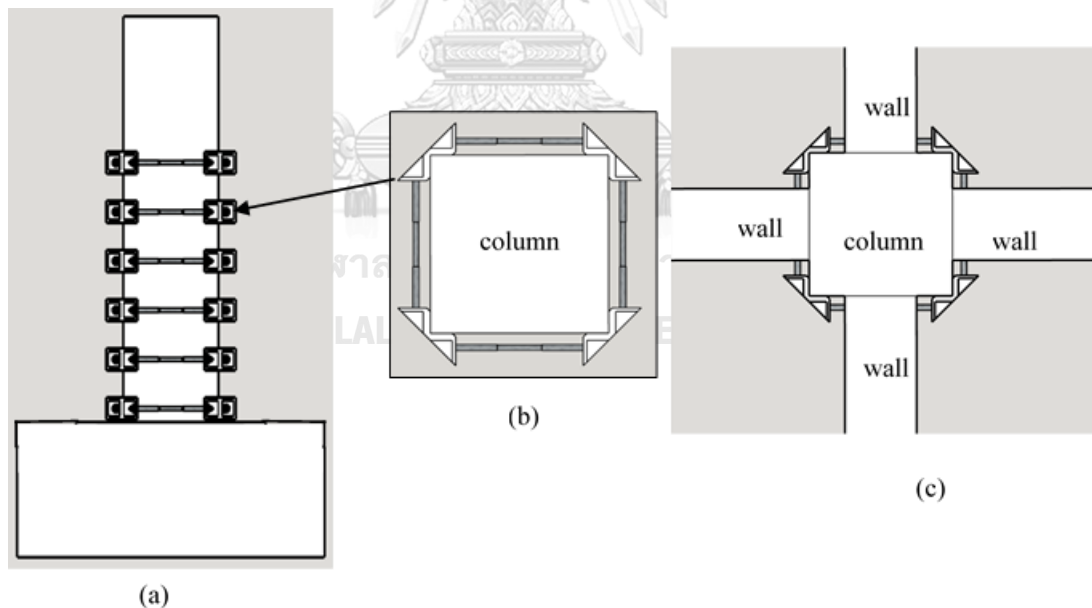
Typical strengthened column (b) steel rods-collars (c) Setting up the steel-rod collars in the column with masonry infill wall
